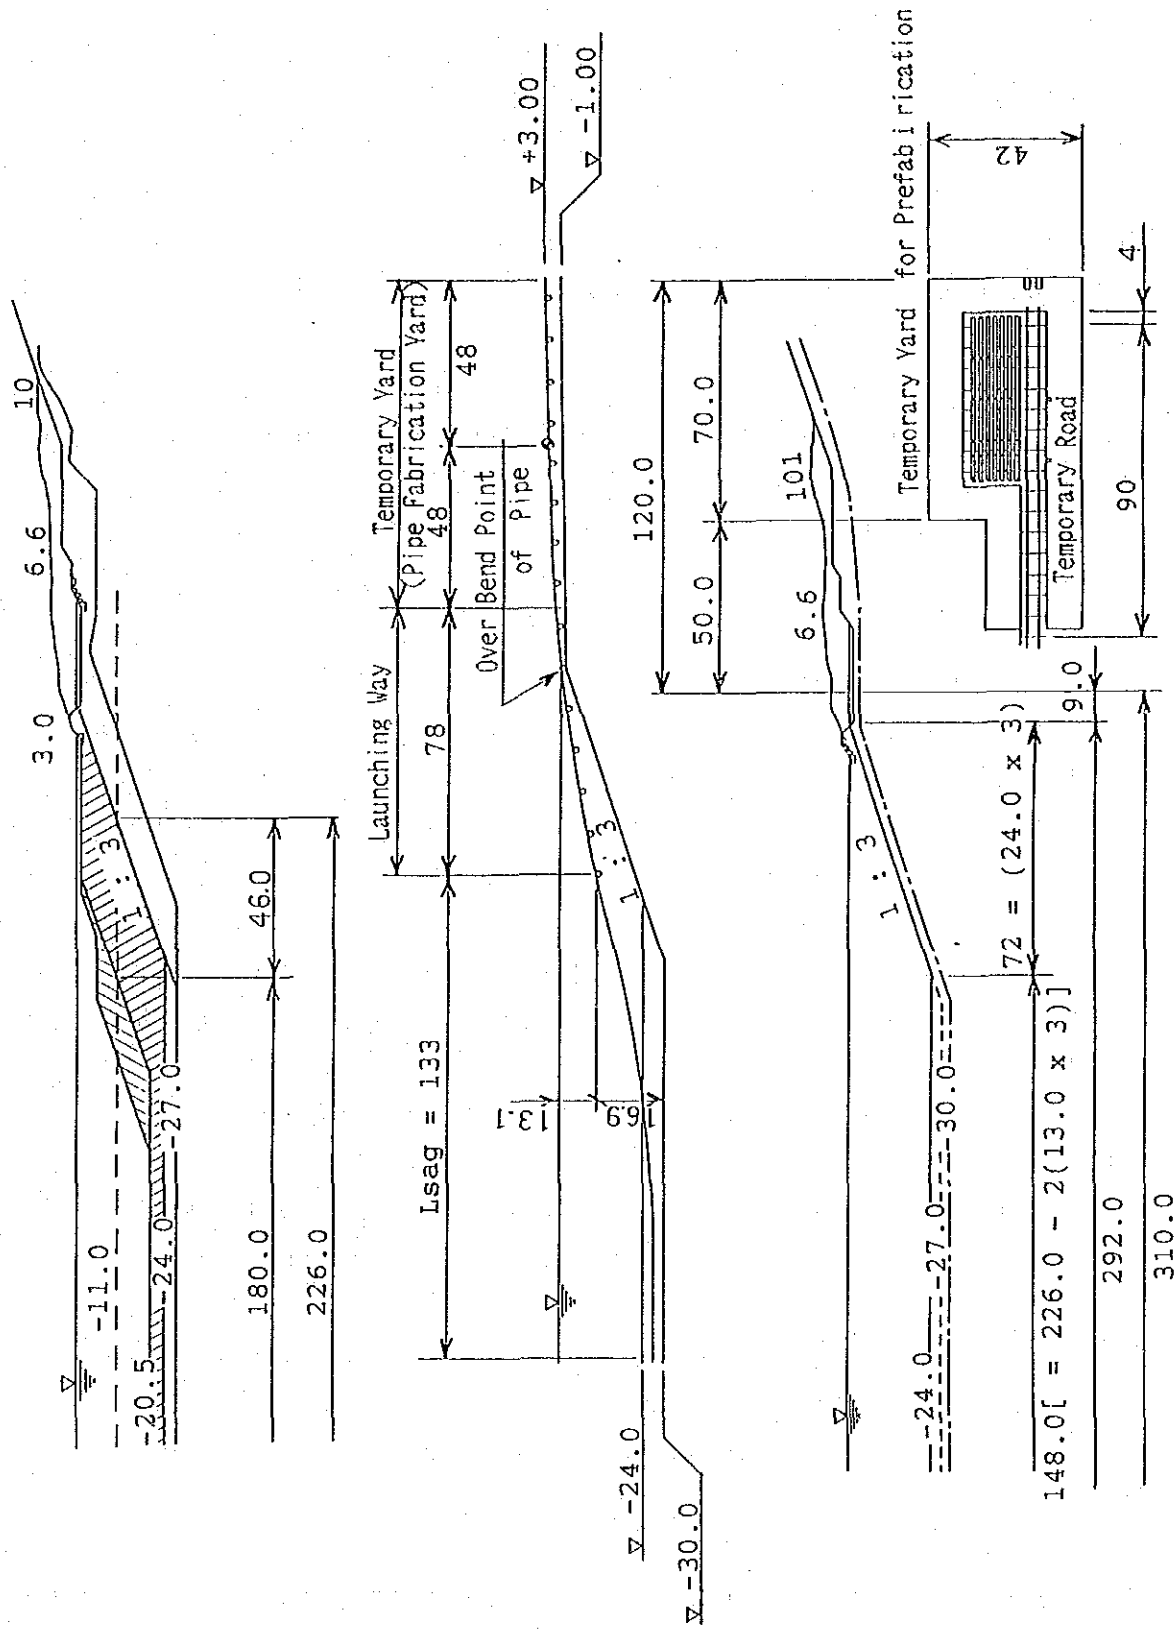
Temporary Yard for Prefabrication of Suez Canal Bottom Crossing Pipes (4X12m=48m)
